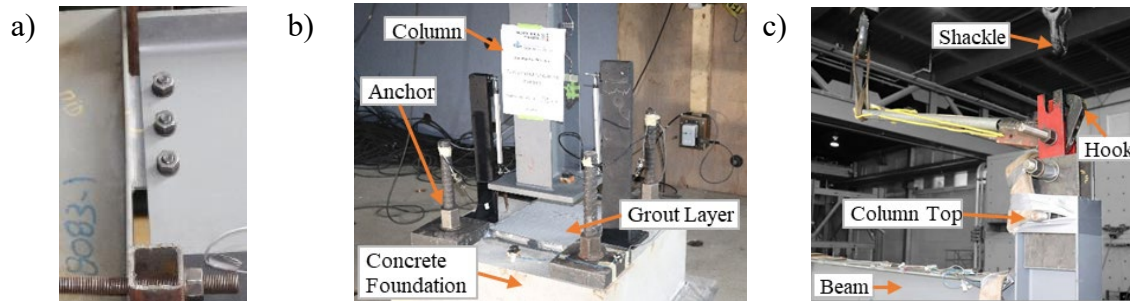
Details of the test specimen: (a) Beam-to-column connection; (b) Base of the uplifted GCRBF column; and (c) Uplift trigger mechanism of the rocking column.
